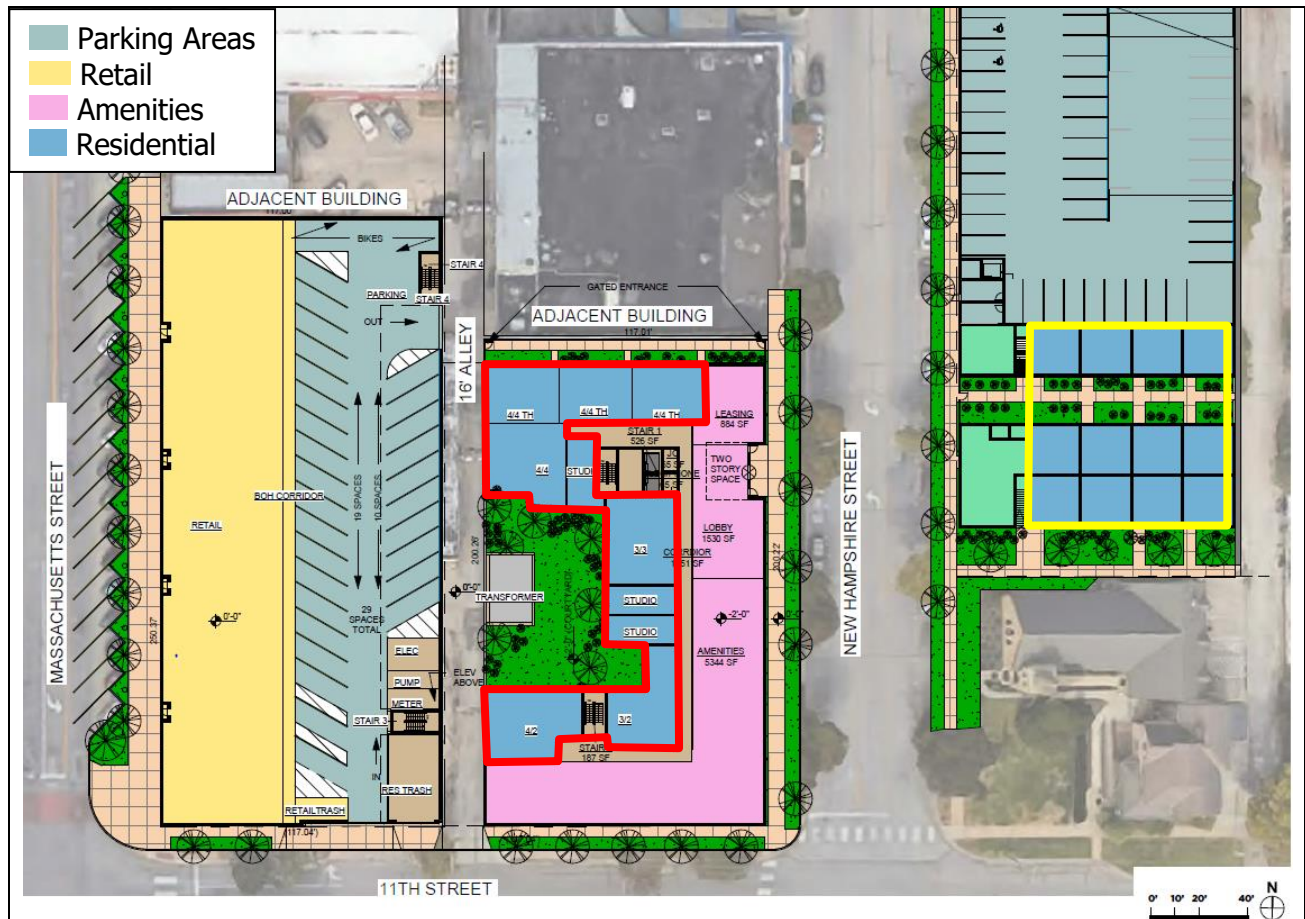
First floor of the proposed development. The ground floor dwelling units associated with this special use permit request are outlined in red. The ground floor dwelling units proposed with SUP-19-00033 are outlined in yellow.
